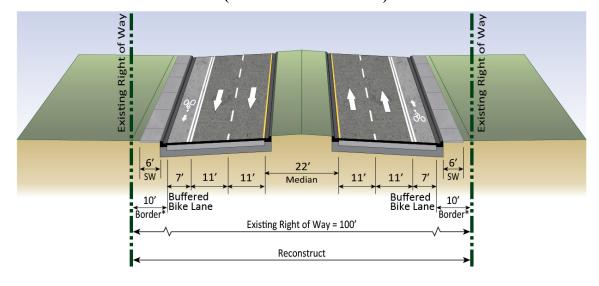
SR 29 Typical Section from North of Westclox Street to the SR 29 Bypass Junction
